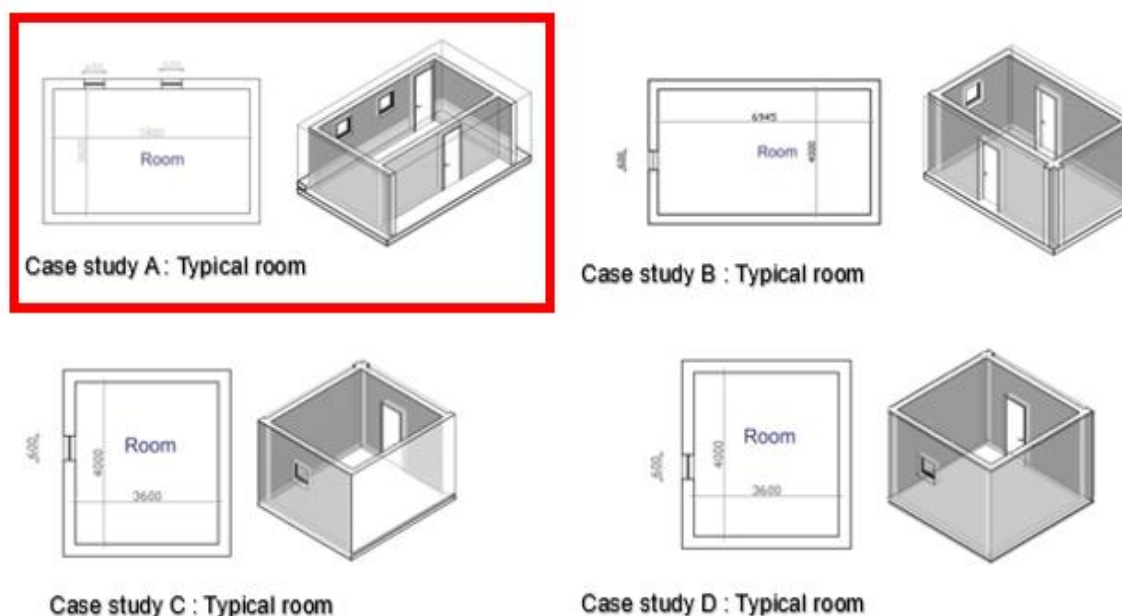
Typical Ilorin adobe traditional room plans and models
